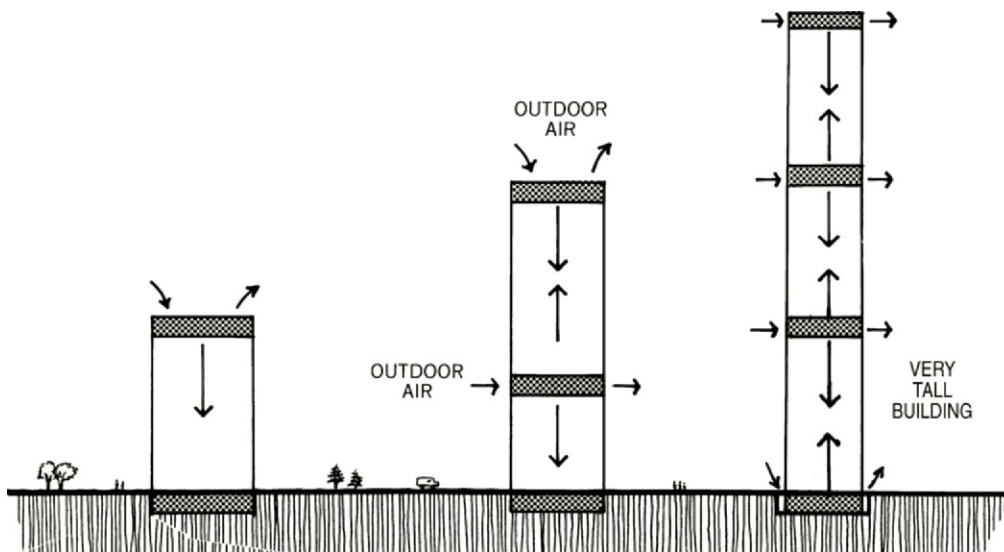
Common locations for centralized mechanical-equipment spaces in large multistory buildings are shown.
